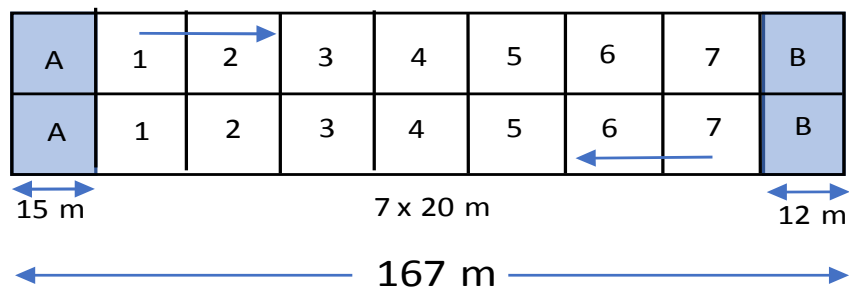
Typical layout of a Trial/experimental Section - not to scale
